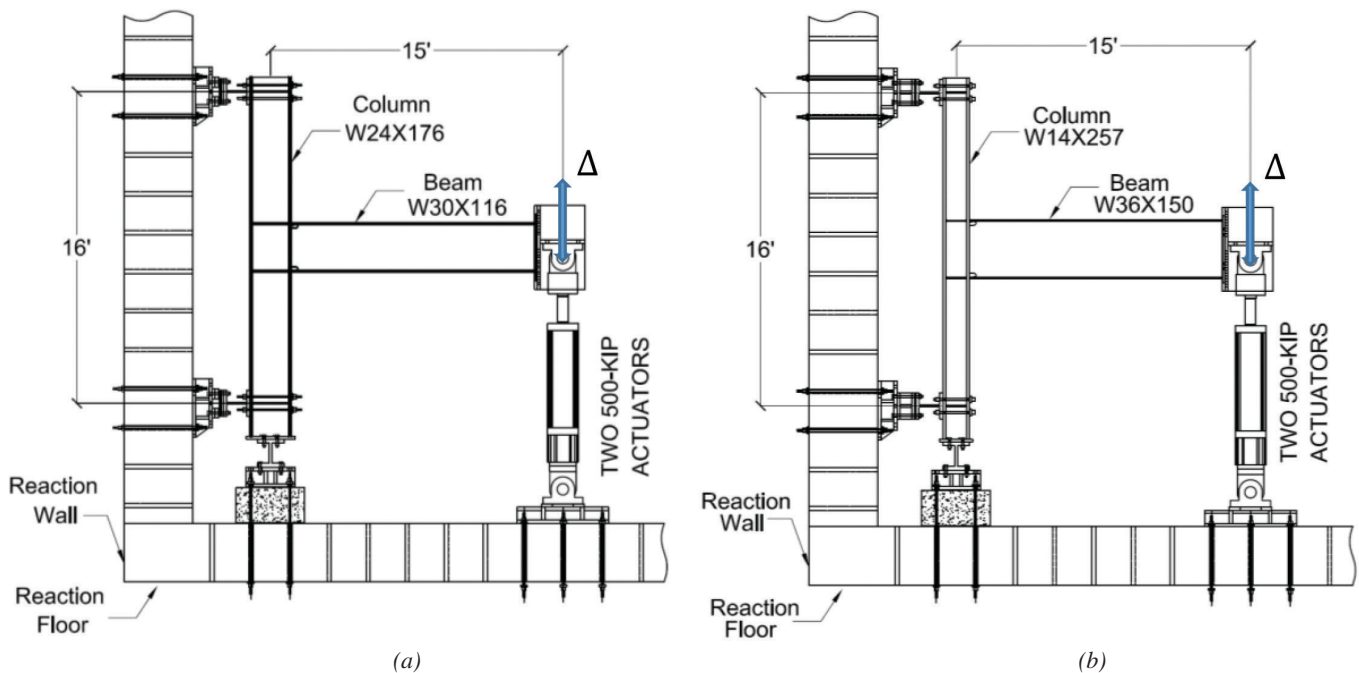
Test specimens and test setup: (a) specimen C1; (b) specimen C2.
